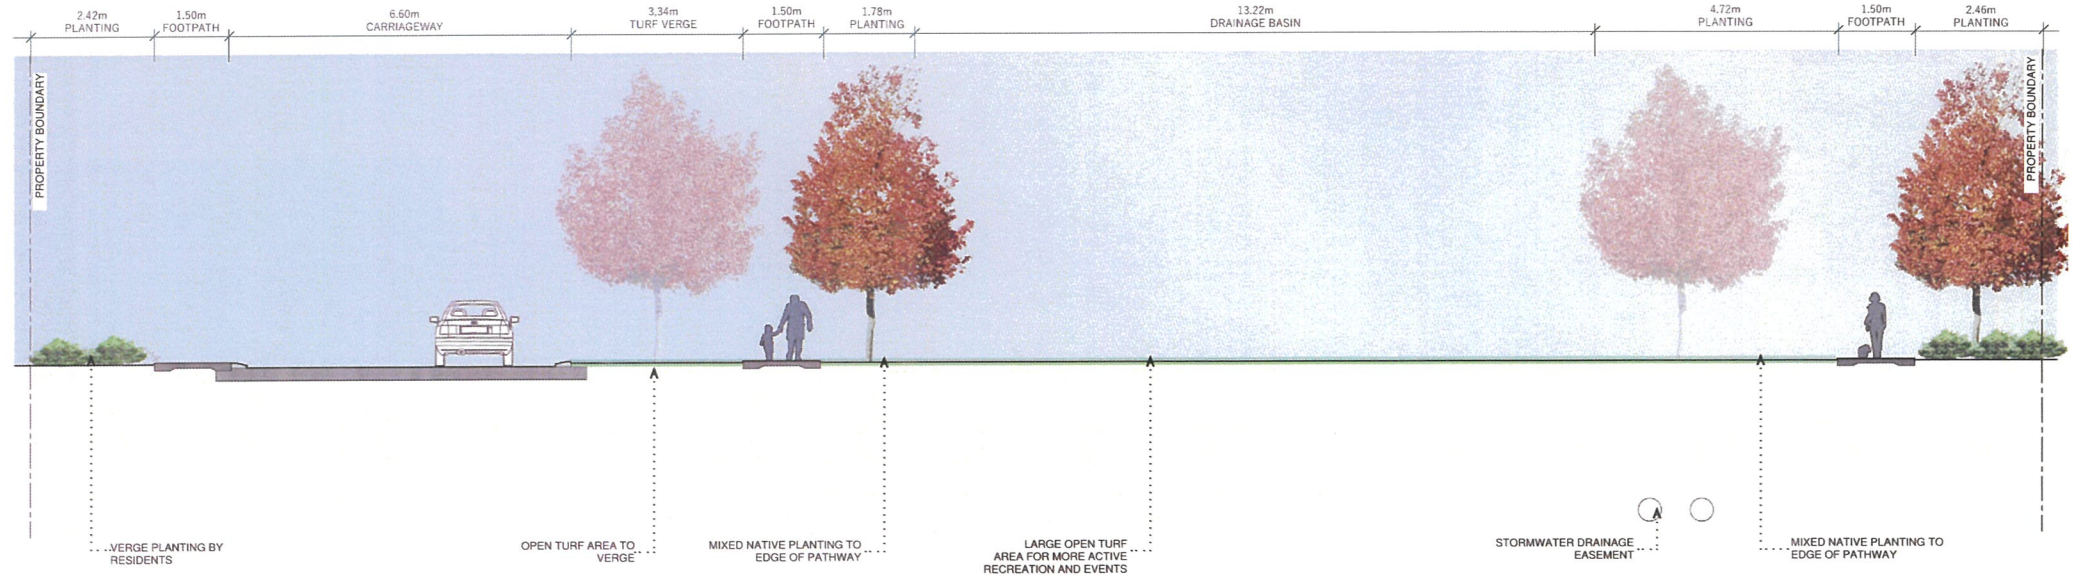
DETAIL SECTION A - ENTRY ROAD LANDSCAPING
